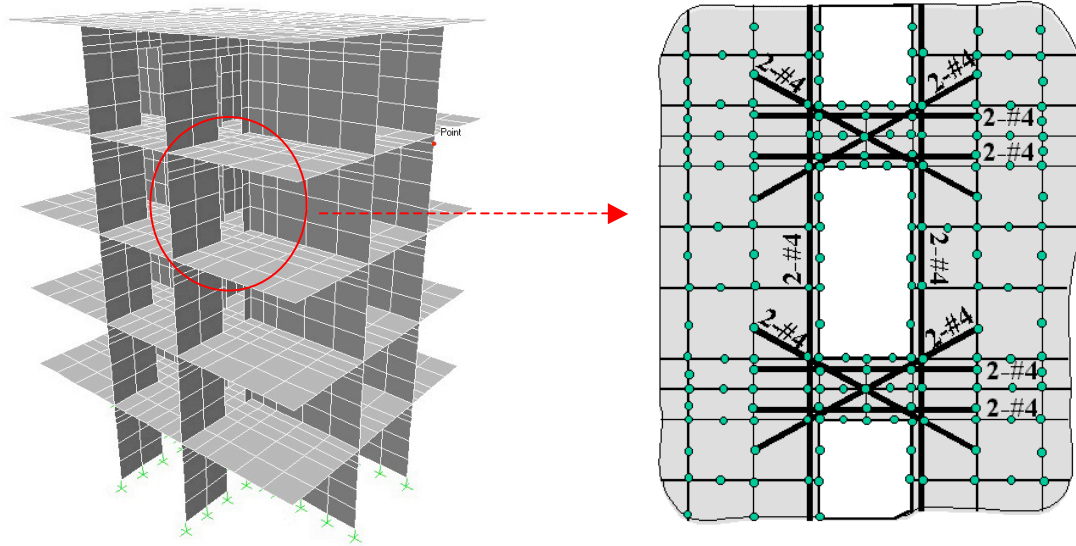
(a) Finite element modeling of shear-walls and slabs, (b) discrete and smeared reinforcement modeling
